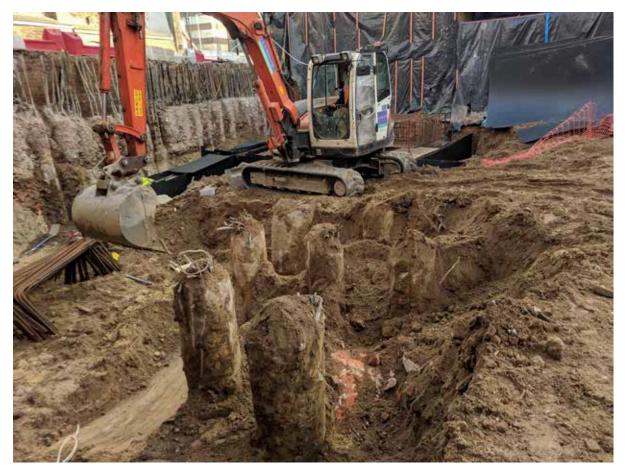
Site visit, facing north-east. In the foreground an area of piling can be seen, having truncated and largely destroyed a likely cellar structure.
